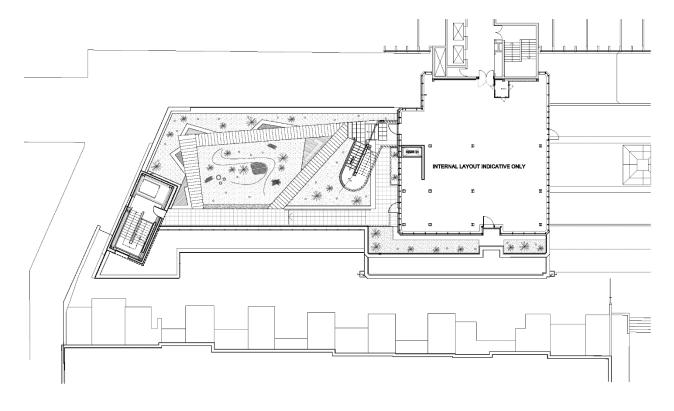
Level 6 roof plan as proposed with reinstated cantilever, amended stair and terrace in lieue of sloped glazing
